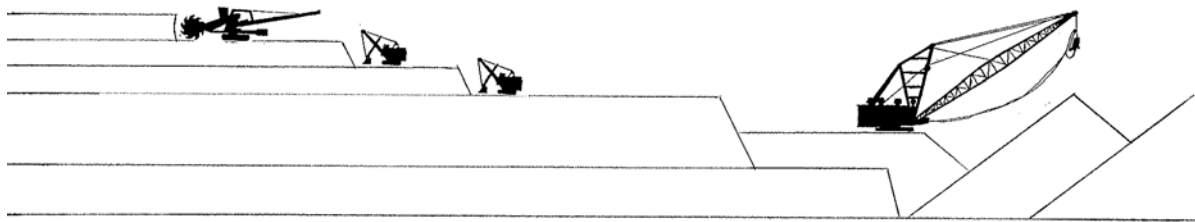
General Cross section of mine plan for Hei Dai Gou Mine.
